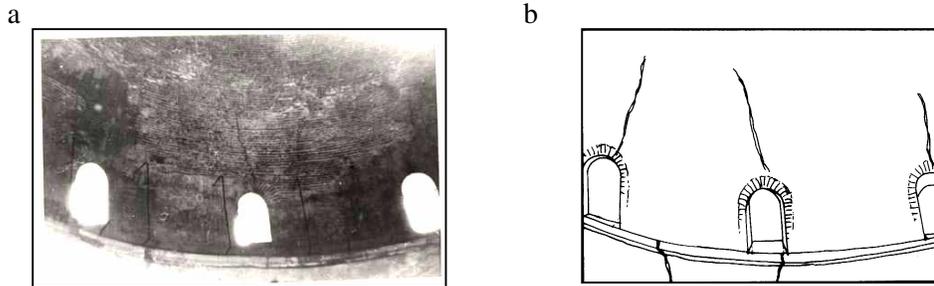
Cracks at the inner surface of the dome in Ahaltsihe: a) picture; b) scheme
